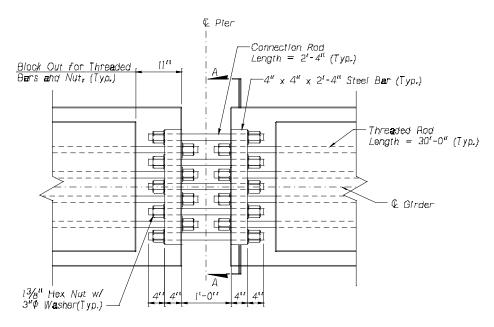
Plan View of Threaded Rod Continuity Connection at the Piers
